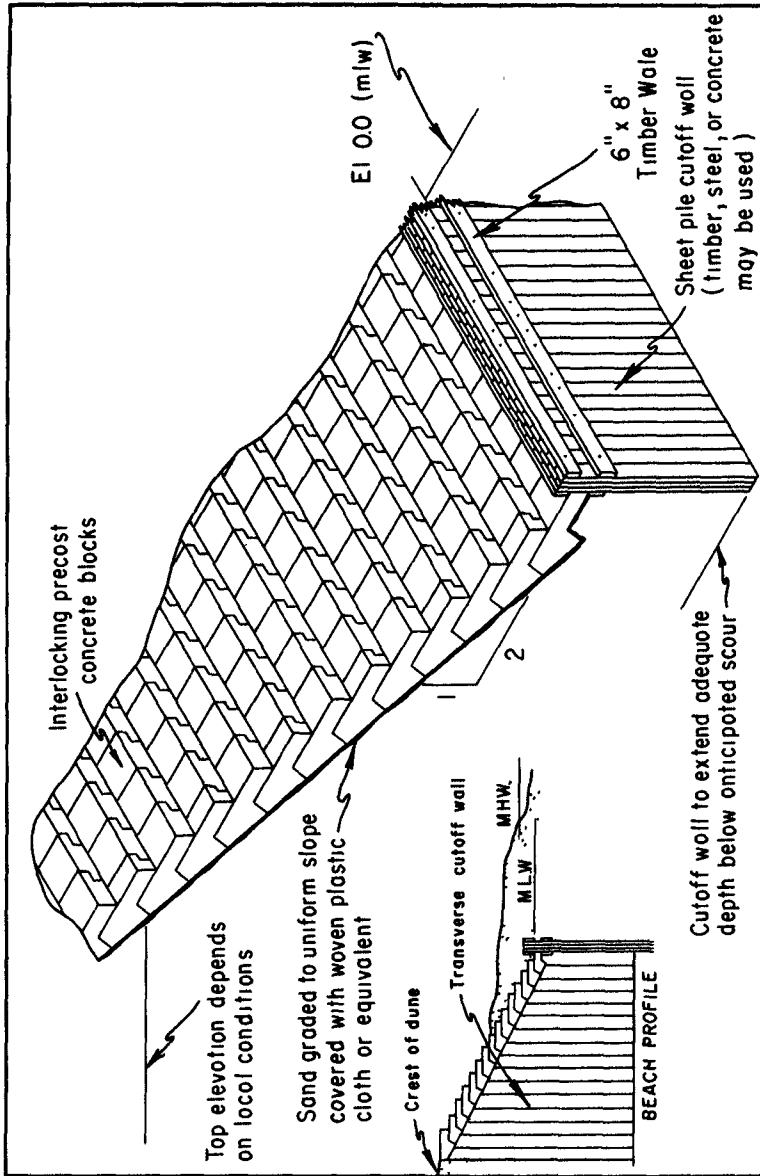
STEPPED TYPE INTERLOCKING PRECAST CONCRETE BLOCK SEAWALL
